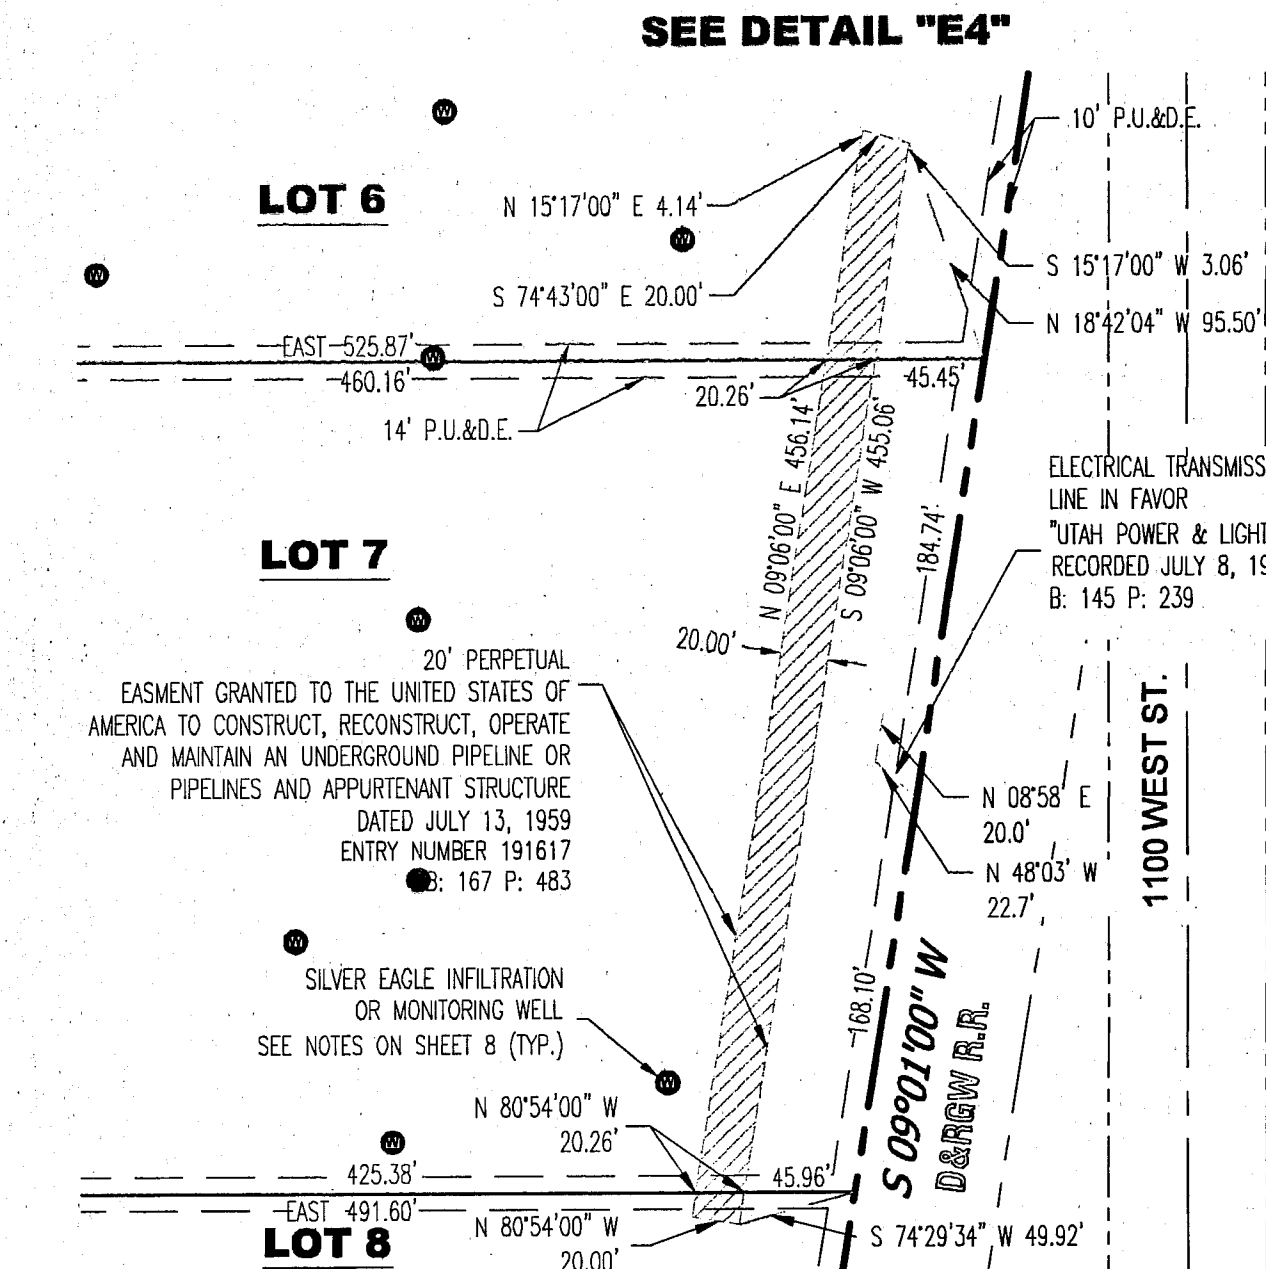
" (ROCKY MOUNTAIN PIPELINE SYSTEMS & UTAH OIL REFINING COMPANY)
